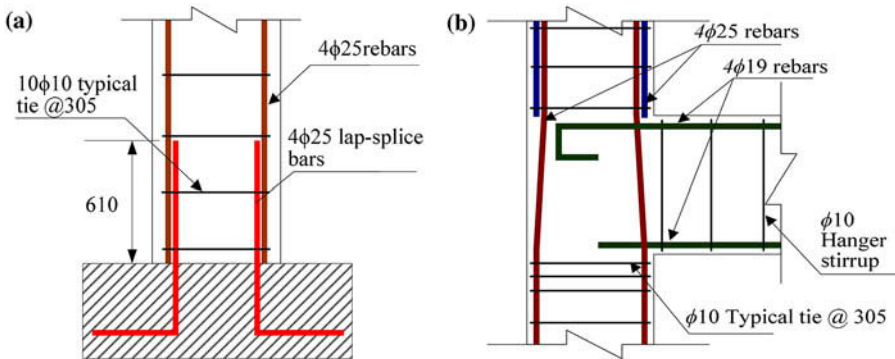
Reinforcement details of the full-scale, as-built test frame: (a) first-story column; and (b) first-story exterior beam–column joint [Wright, 2015].
